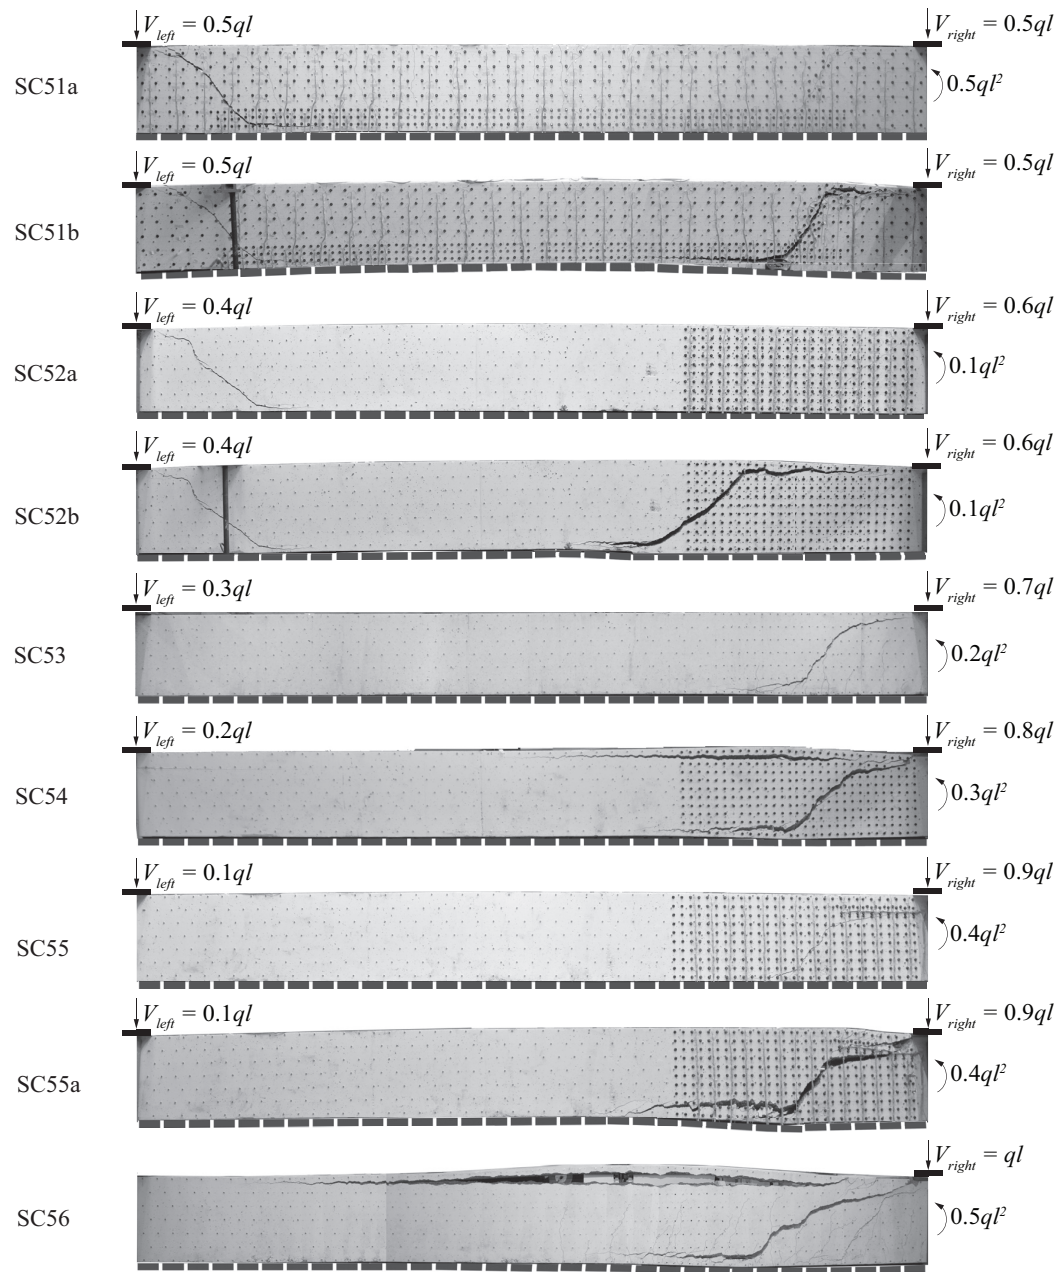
Photos of crack pattern after failure: members subjected to distributed loading.
